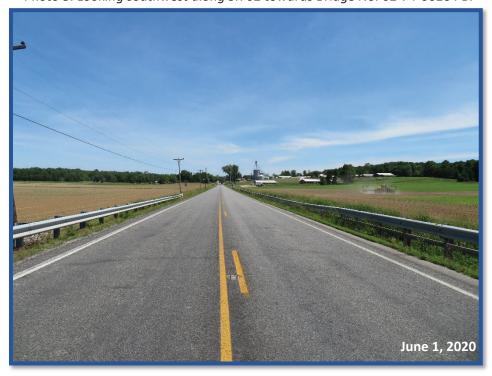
Looking northeast along SR 62 from north of Bridge No. 62-74-06164 B.
